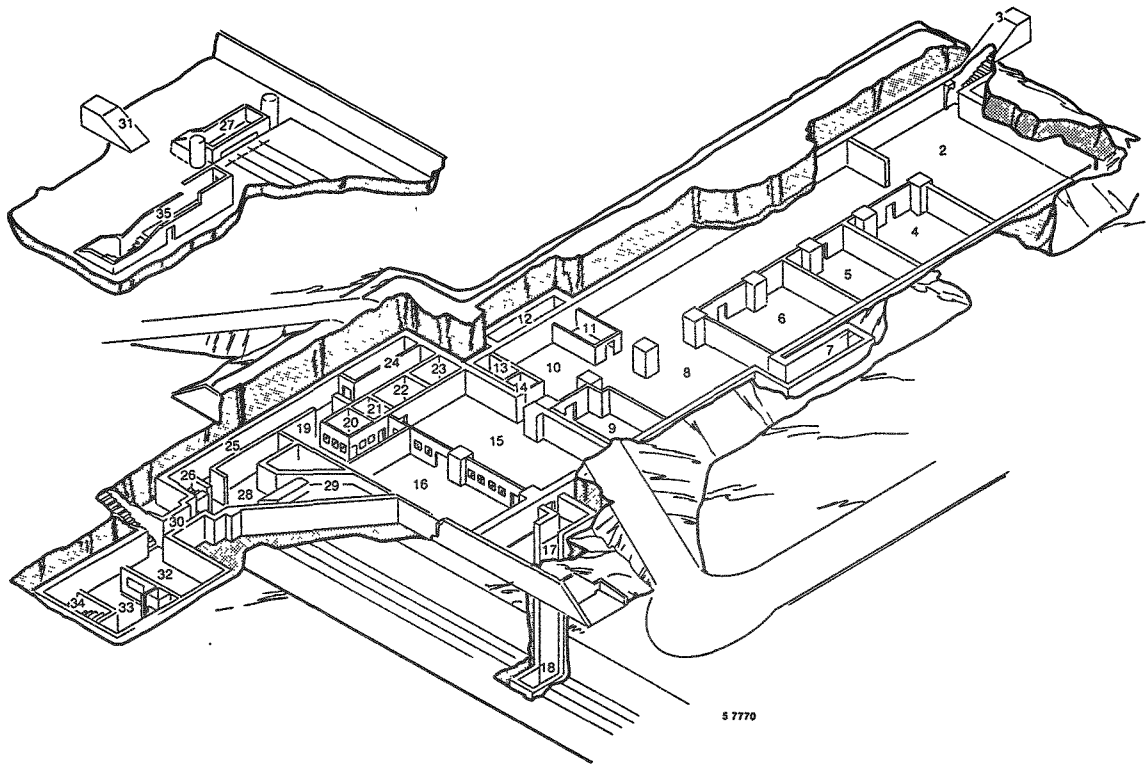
Isometric layout of IET Control and Equipment Building—TAN-620.
